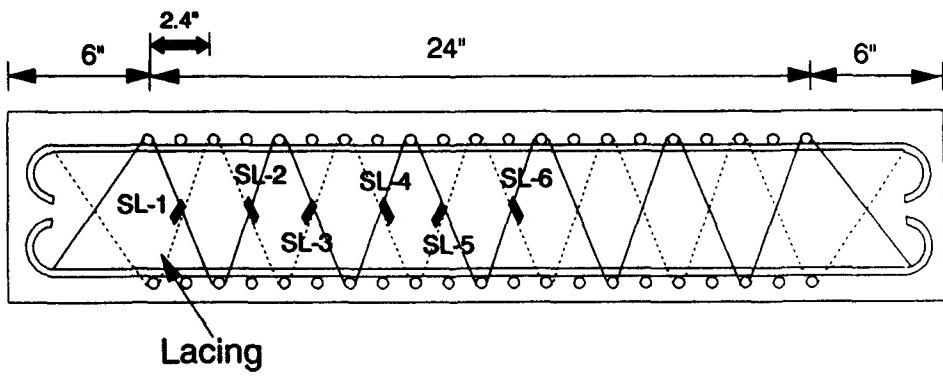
Strain Gage Locations on Lacing in Slab Nos. 4 and 5
